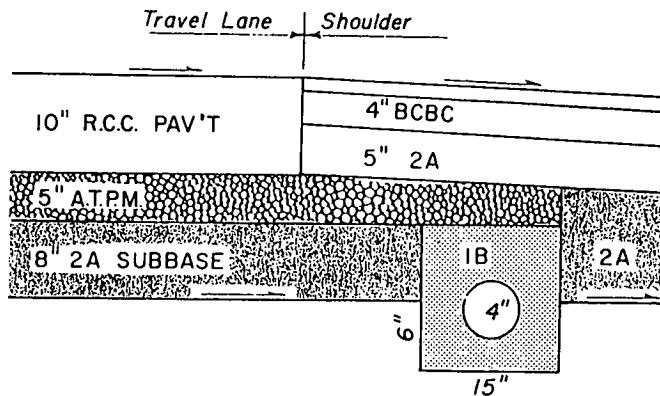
Pavement cross section (asphalt-treated permeable material test area) (Pennsylvania) (53).
